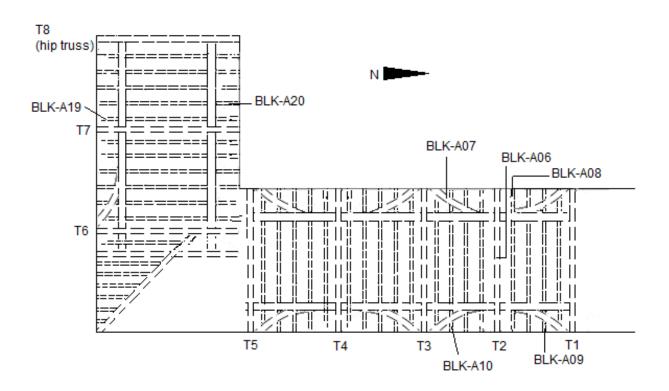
Sketch plan of the main range and cross-wing roofs, showing the location of samples BLK-A06–10 and BLK-A19–20
